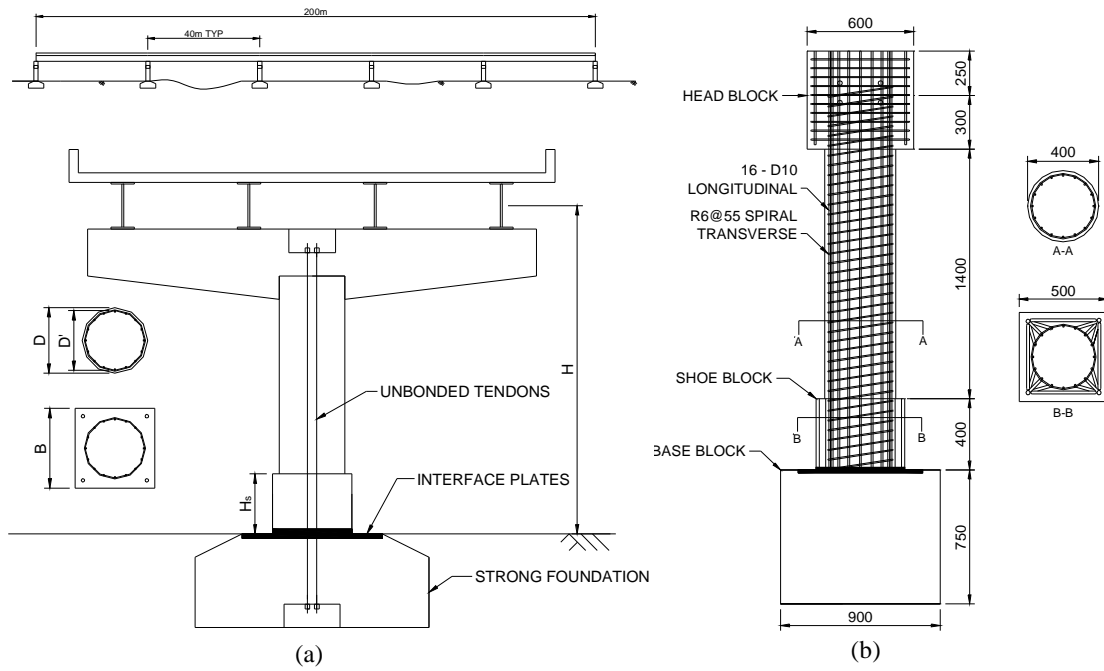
Bridge pier details: (a) prototype bridge pier; (b) 30% scaled specimen.
